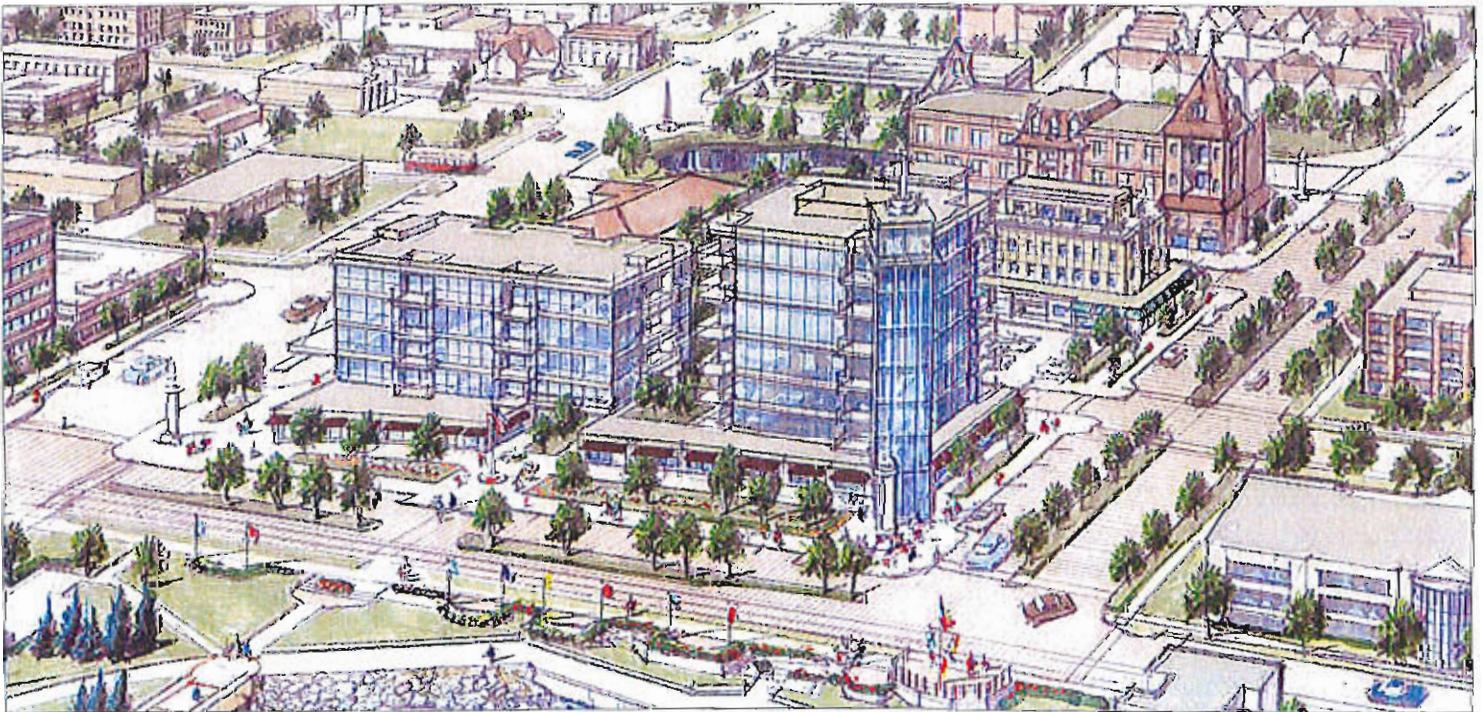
Bird's Eye Rendering of Envisioned City Hall Redevelopment Site - viewed from Kenosha Harbor looking west
